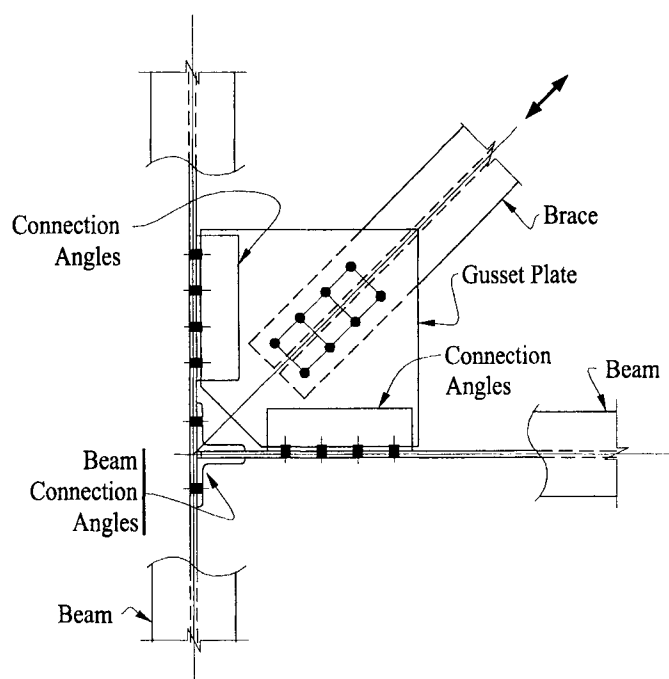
Horizontal brace connection at beam-to-beam intersection.
